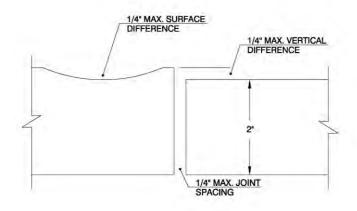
Bluestone Spacing and Vertical Tolerances (Section View)
